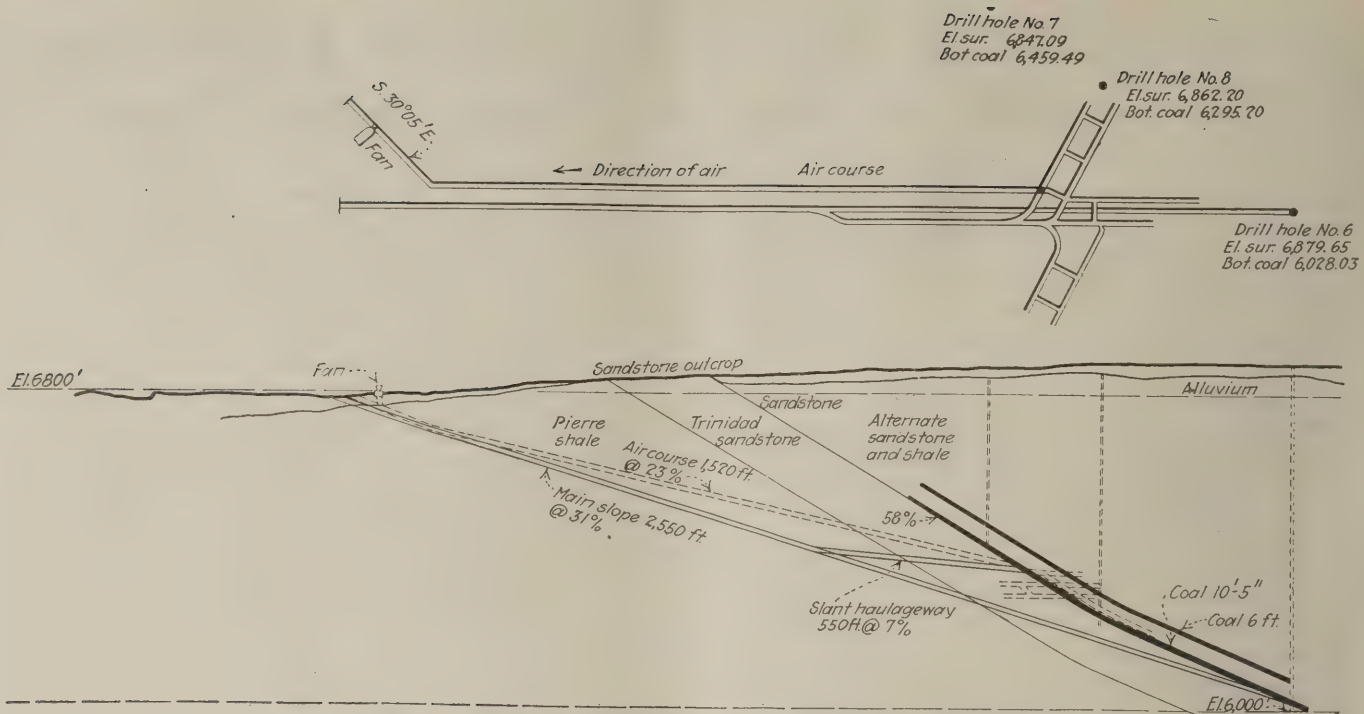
Plan and Elevation of the Rock Slope, Slant and Coal Workings
